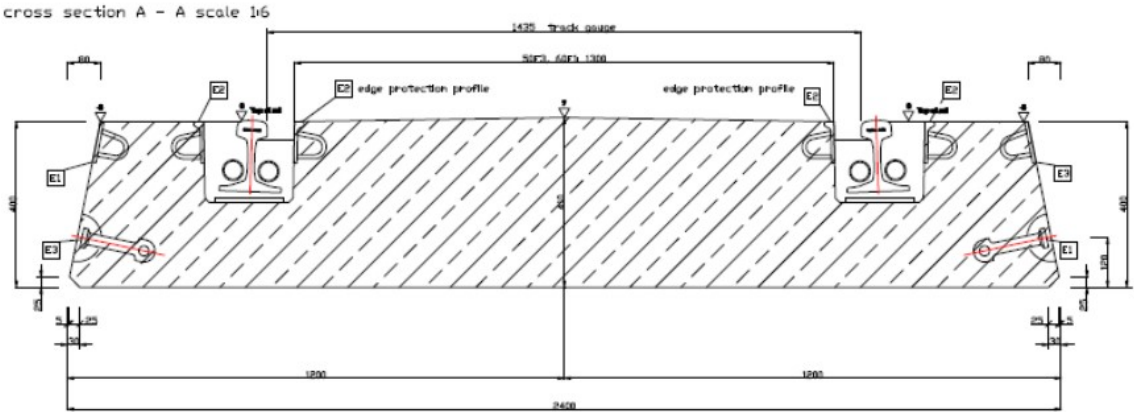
Cross-section of the Edilon LC-L surface type (Tines www-site)
